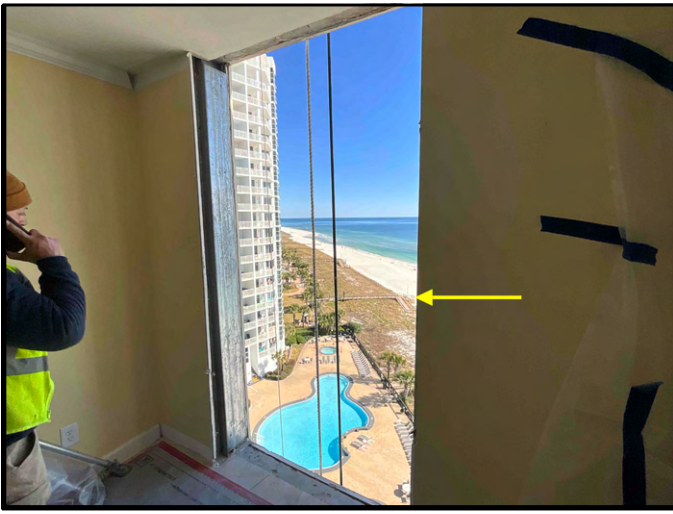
Unit No. 1100 - North Bedroom - View of rough opening to be prepared for EFCO window installation.
